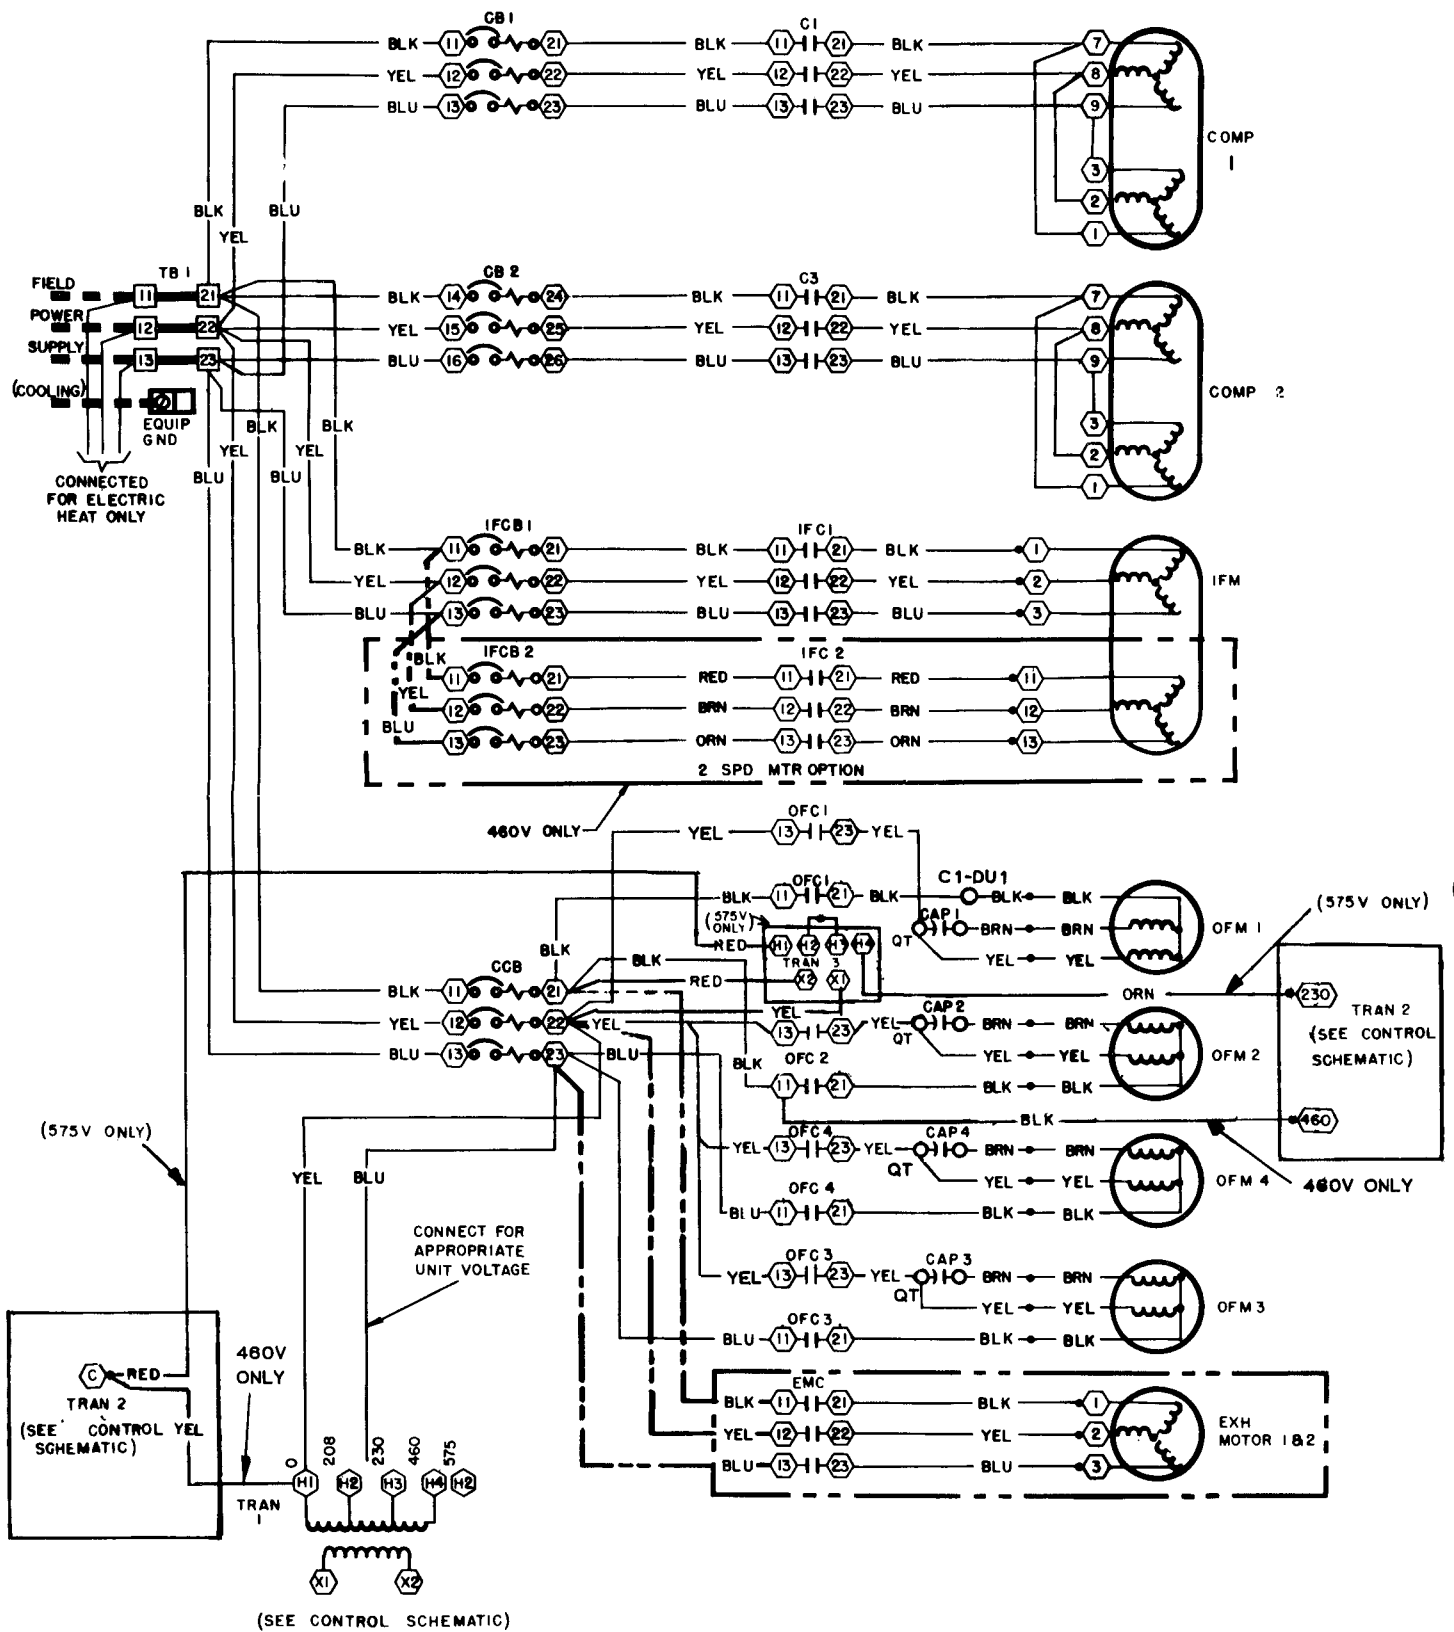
Power Wiring Schematic; 50DL054; 460, 575-3-60
